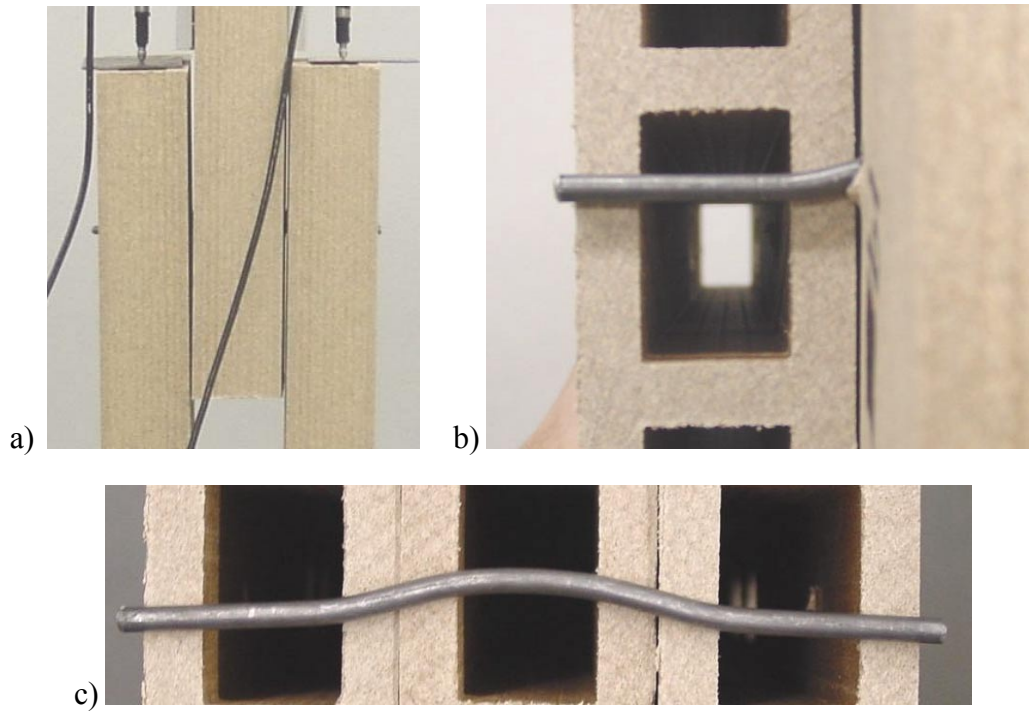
HDPE Mode IV connections a) Entire connection b) Location of dowel yielding in side member c) Approximate location of dowel and walls during testing
